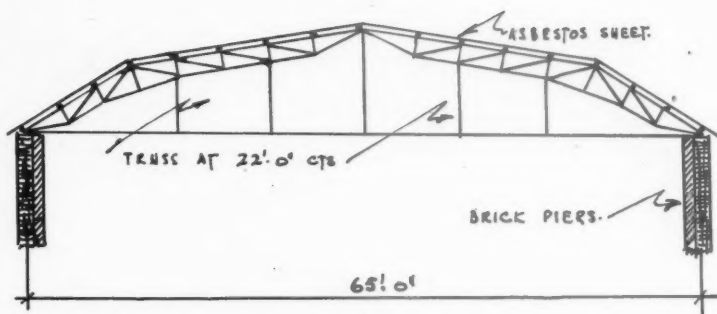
Composite tubular roof truss used in conjunction with brick construction.
